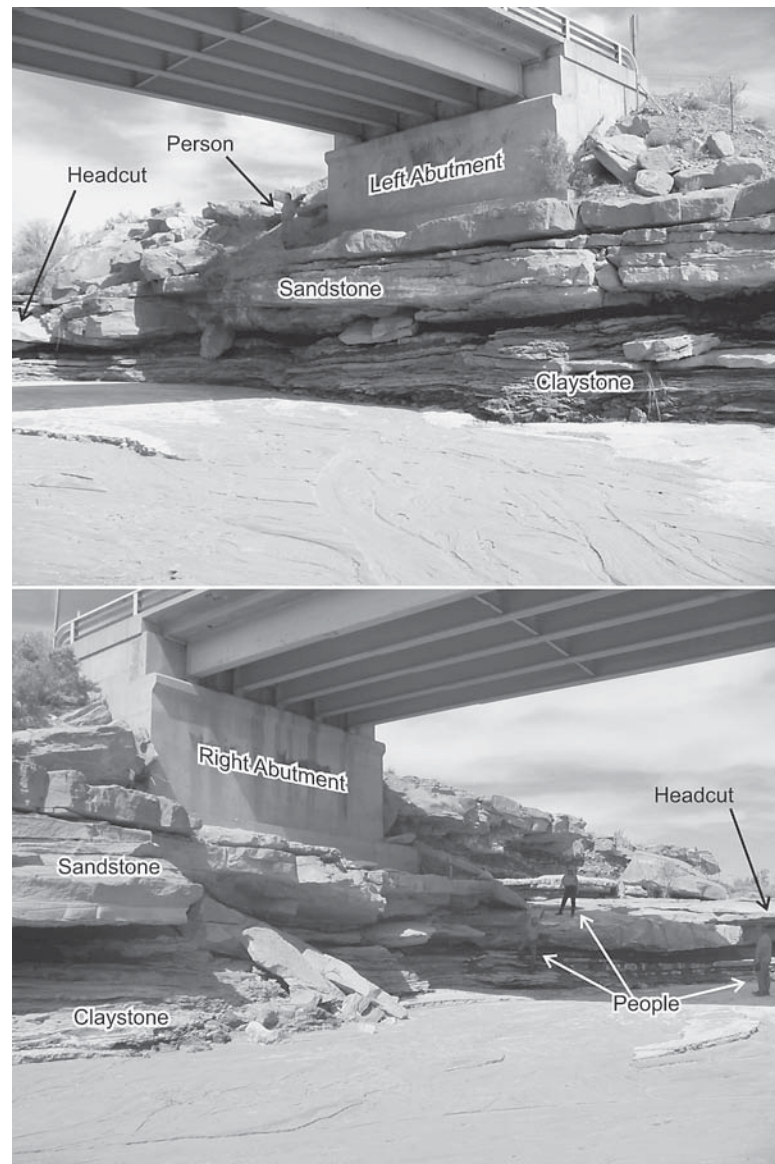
Exposed sandstone and claystone at the abutments of the SR-262 Bridge over Montezuma Creek. Photographs from HDR (2004) report show conditions on November 17, 2003.
